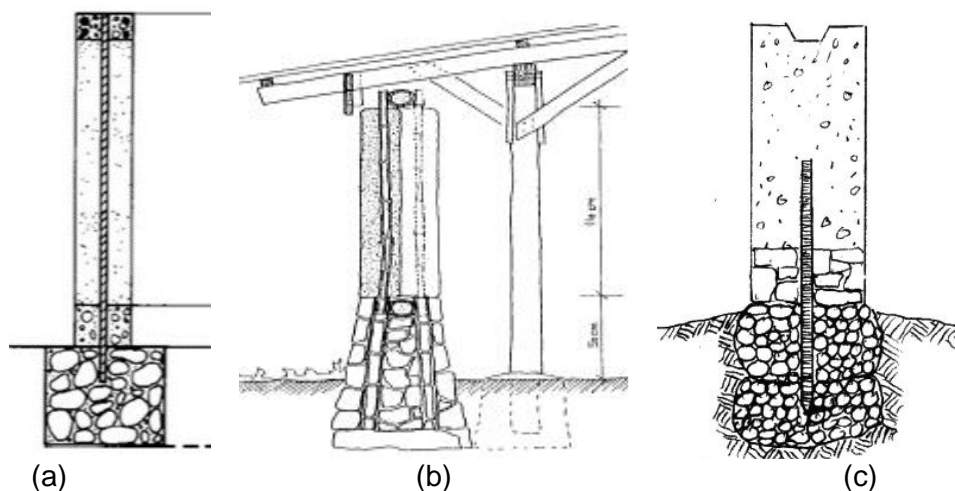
Internal reinforcement with vertical rods (a) foundation of external walls should be at least 40cm deep and made with stones; (b) separation of roof and wall system with ring
